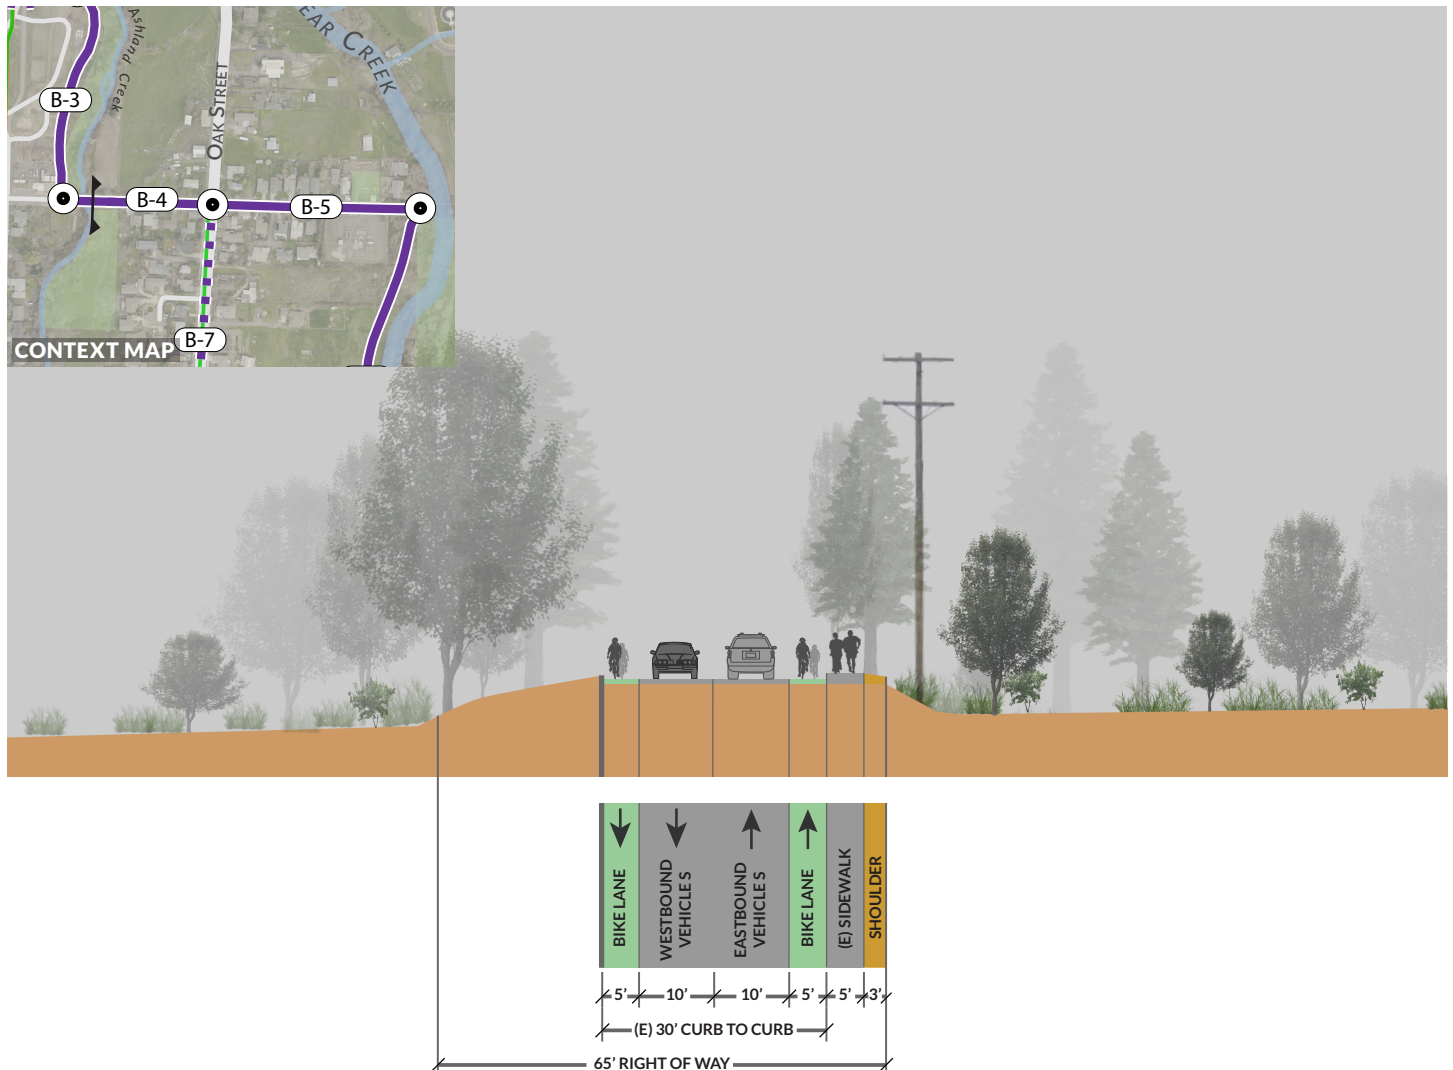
Proposed cross-section for West Nevada Street at Briggs Lane, looking east
